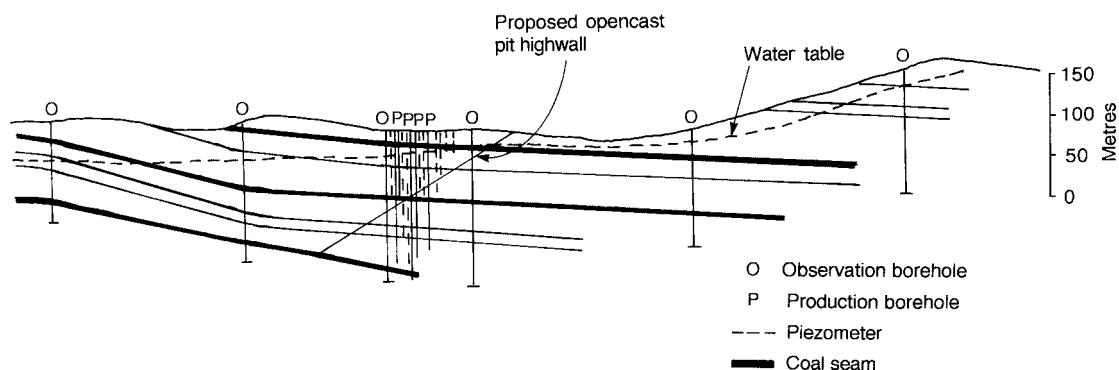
Section across proposed opencast pit showing position of observation boreholes, production boreholes and piezometers, placed to determine groundwater levels and pressurization field around proposed position of highwall in opencast pit.
